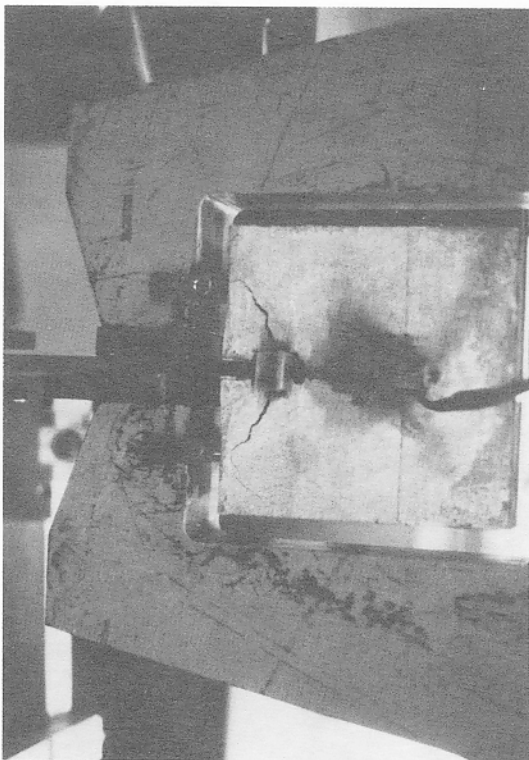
Fracture induced in concrete by the pull out of a short anchor bolt in a Laboratory experiment (courtesy of R. Ballarini, 1988)
